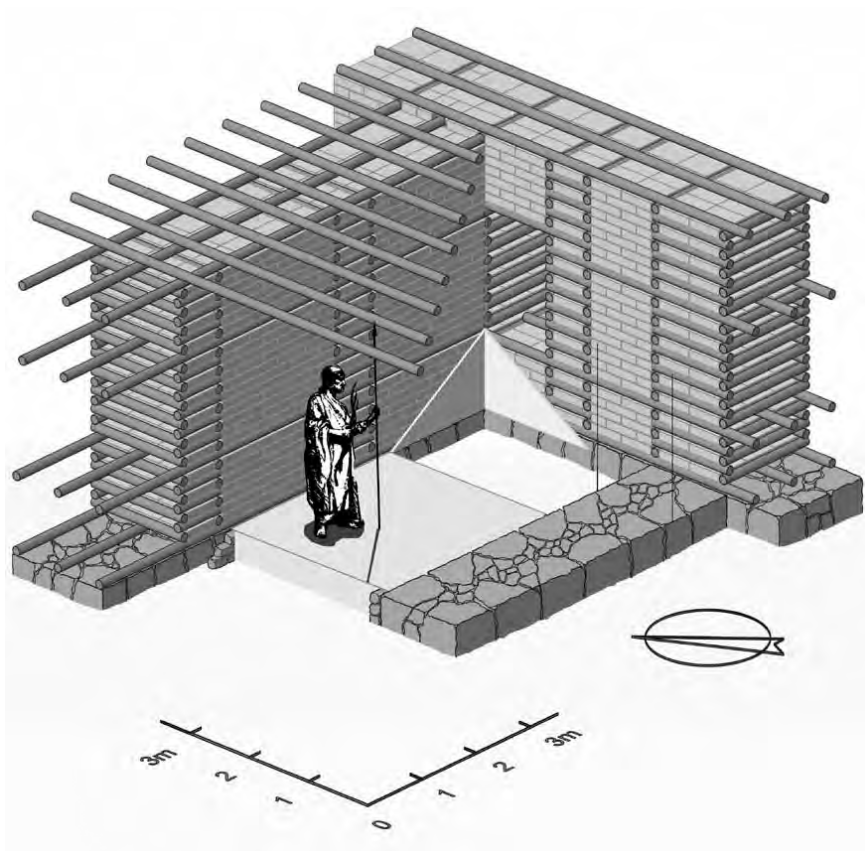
Kuşaklı. Composite masonry with horizontal timber framing on gate walls, isometric reconstruction by Dirk Paul Mielke (Mielke 2009, Abb. 9).
